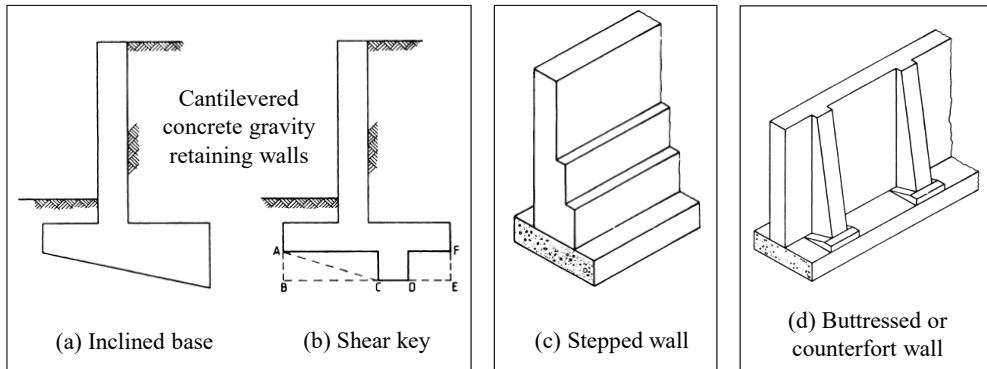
Cast in place concrete gravity walls (BS8002:1994)
